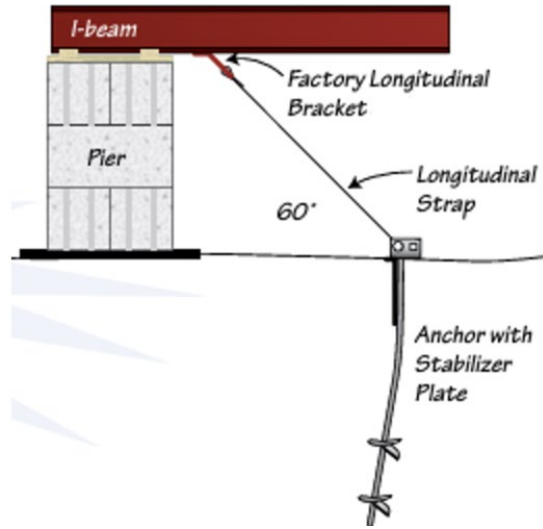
Longitudinal brackets factory installed on the frame I-beam.
